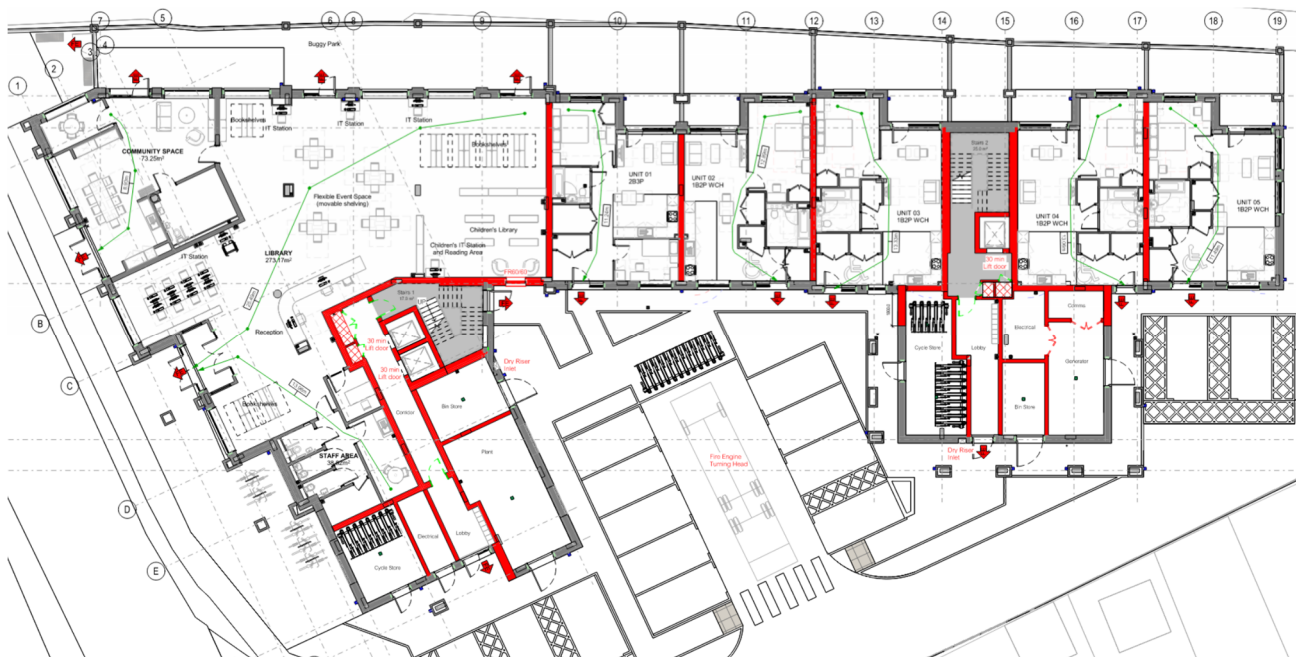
Ground floor layout (Dwg No: M9534-HUN-02-00-DR-A-05-4000).
